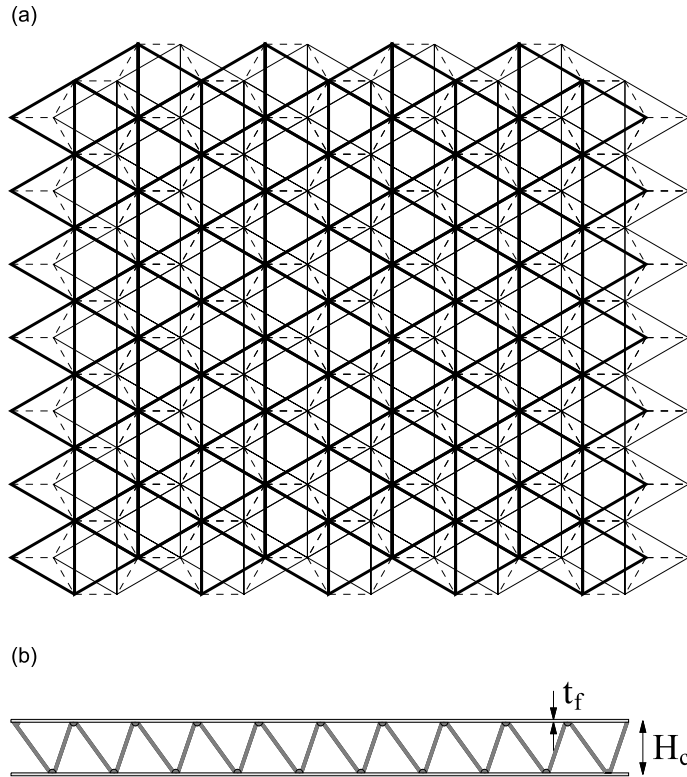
Plate structures with truss cores. (a) Plates with planar truss faces. The darker members are top face members, the lighter solid members the bottom face members, and the dashed members the core members. (b) Plates with solid sheet faces.
